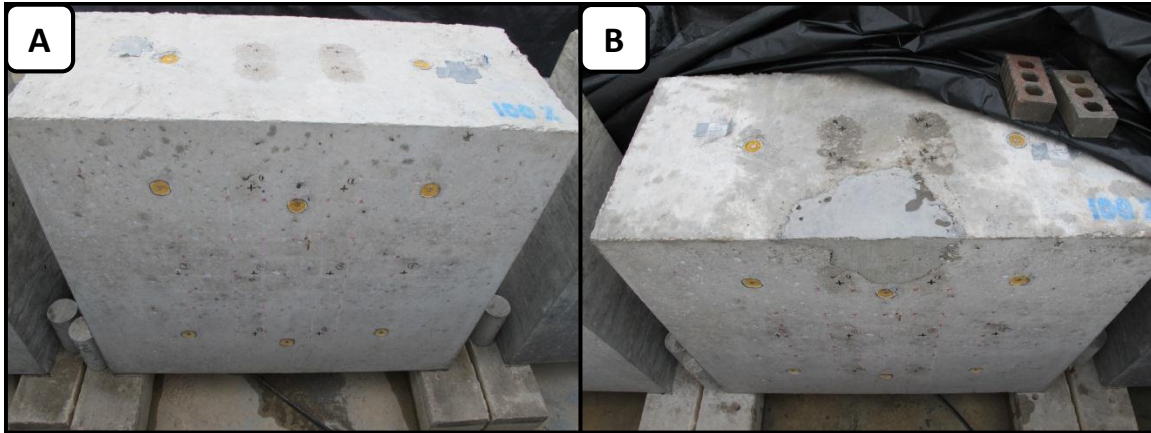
Specimen 1 (A) Before and (B) After Stirrup Severed
